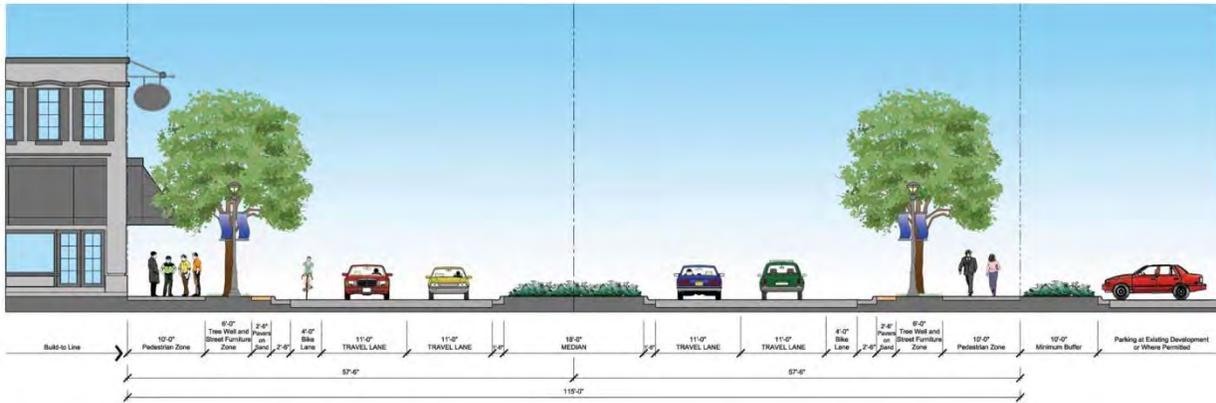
Four Lane Village Center Boulevard Cross-section
